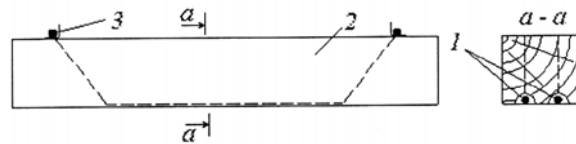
Beam strengthening using tie rods at the inferior part of the element [7]: 1 – FRP tie rod, 2 – beam, 3 – anchorage.
